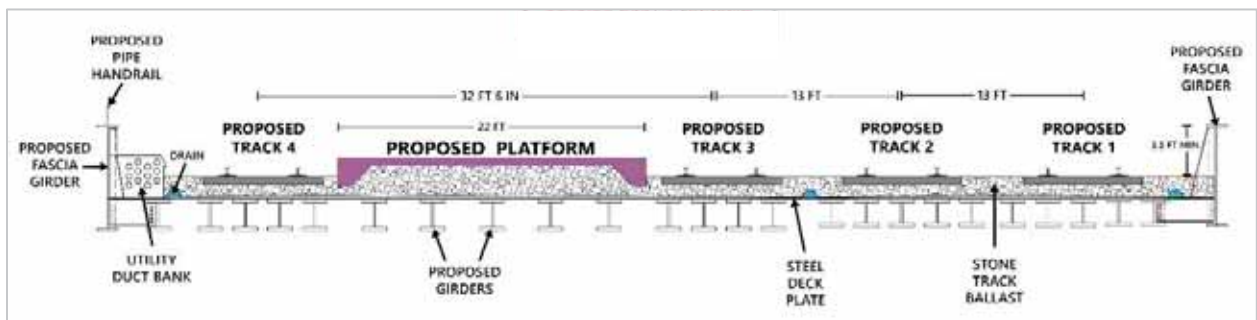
Cross Section of the Proposed Replacement Bridge over 6th Street SW
